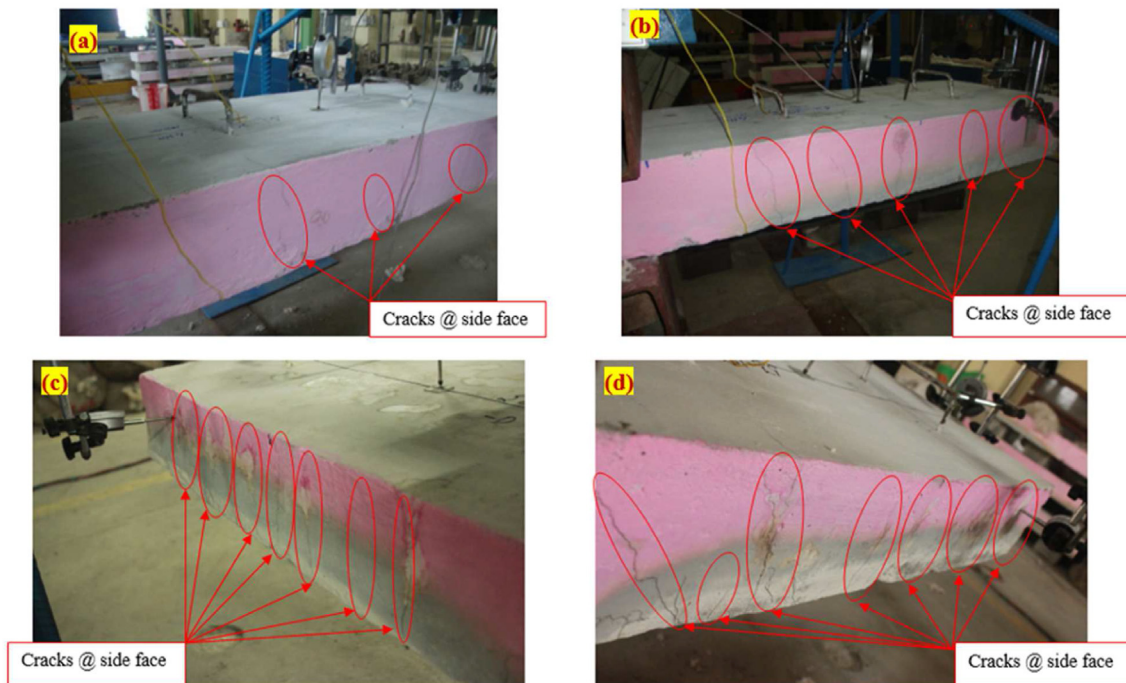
Colour change and cracks at a side face of 150 mm thick concrete slab – thermal loading (a) S1 (b) S2 (c) S3 (d) S4.
